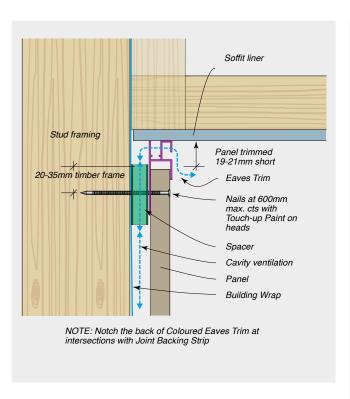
Alternative Sofft Detail – With Timber Trim – Elevation
